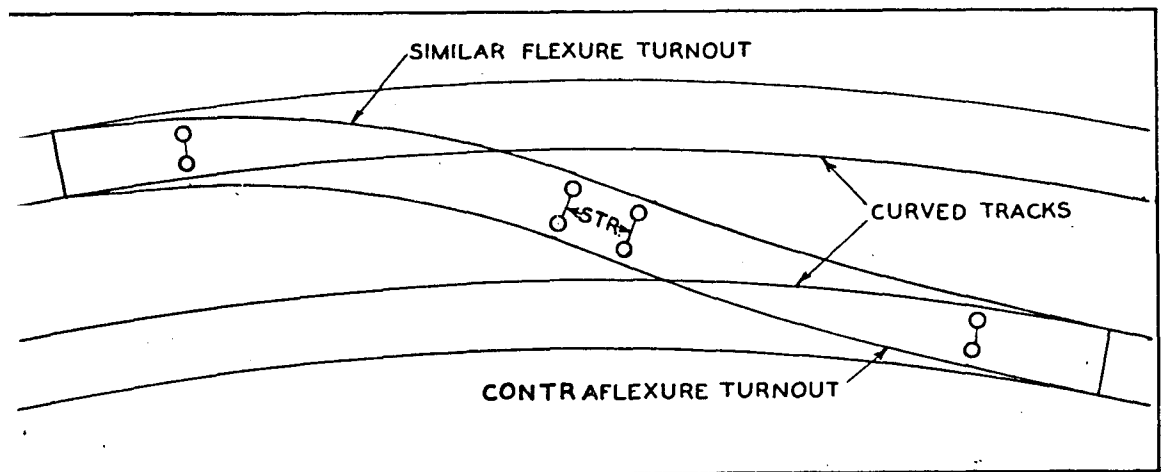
CROSSOVER USING CONTRA & SIMILAR FLEXURE TURNOUTS
